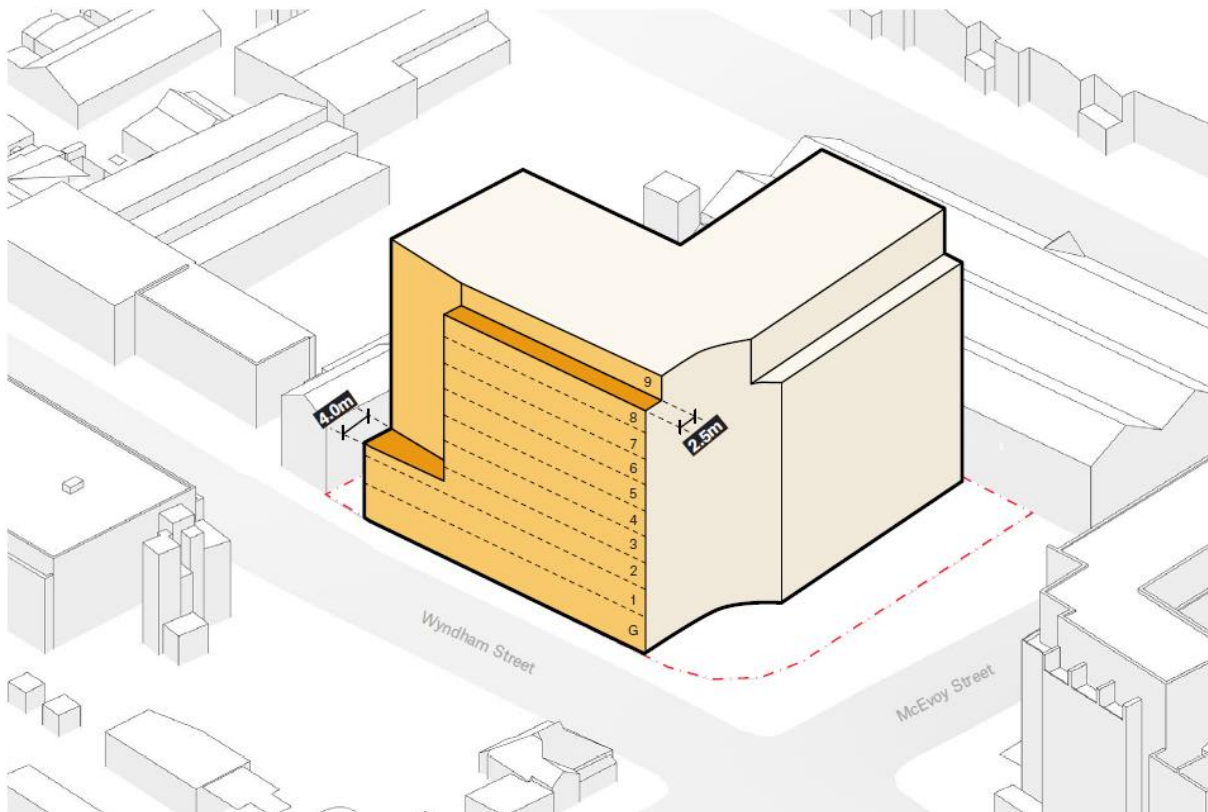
3D view of the proposed envelope viewed from the south-west looking north-east
